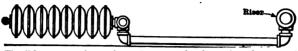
Flexible connection, plan view—used when riser has considerable vertical movement.
